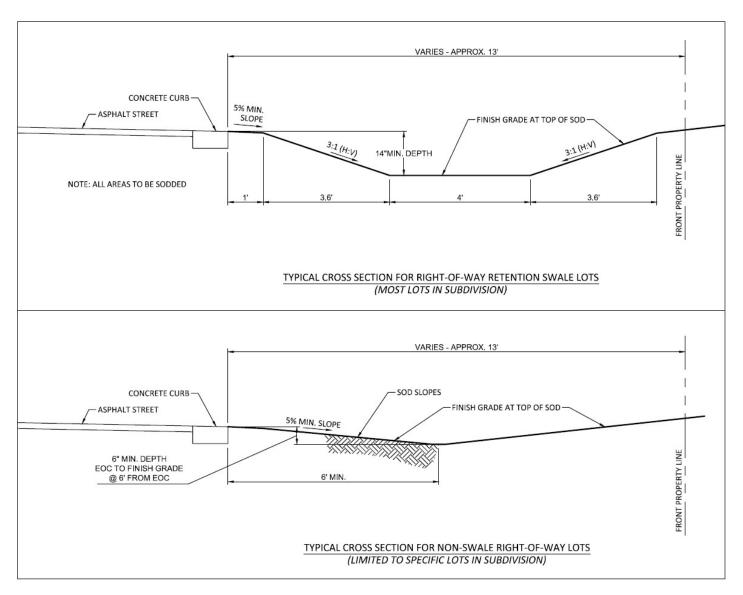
Grading and Drainage Cross Sections within the Right of Way
